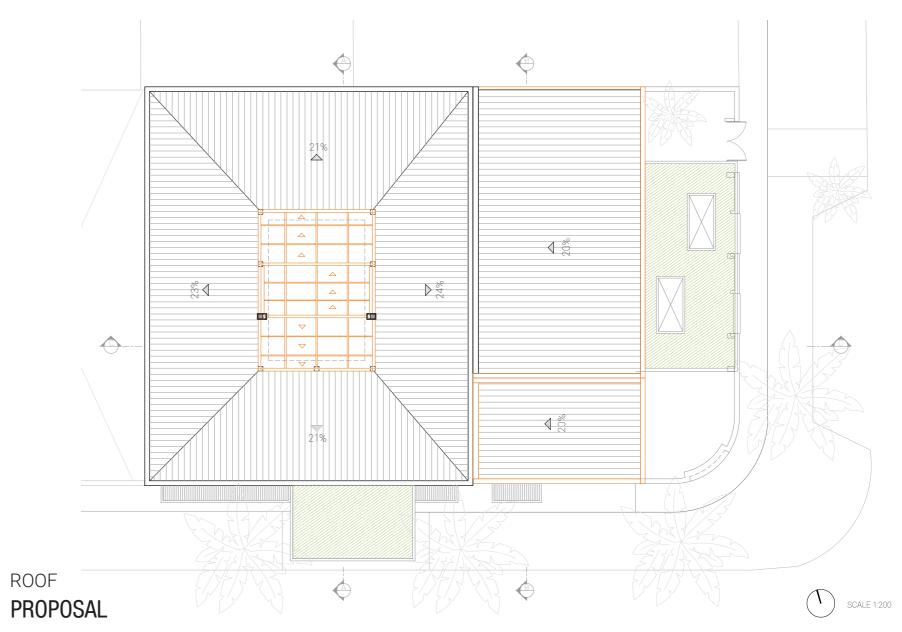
Roof plan proposal/Source: Author's elaboration
